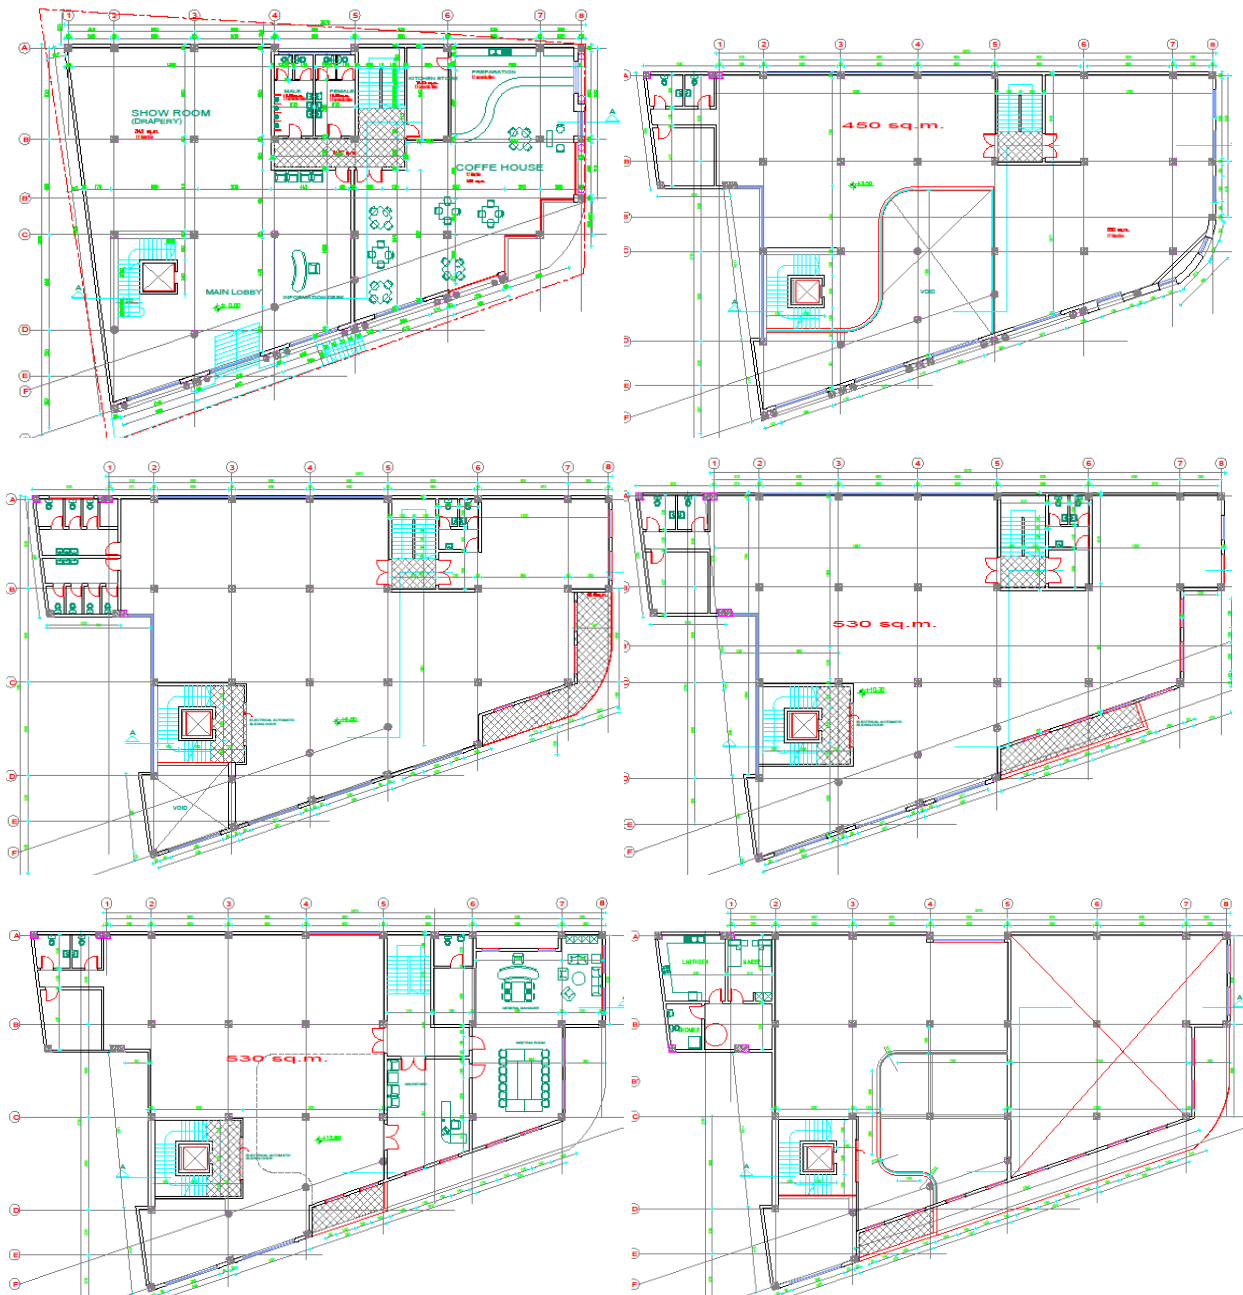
floor plan from ground to fourth mezzanine (top to bottom)
